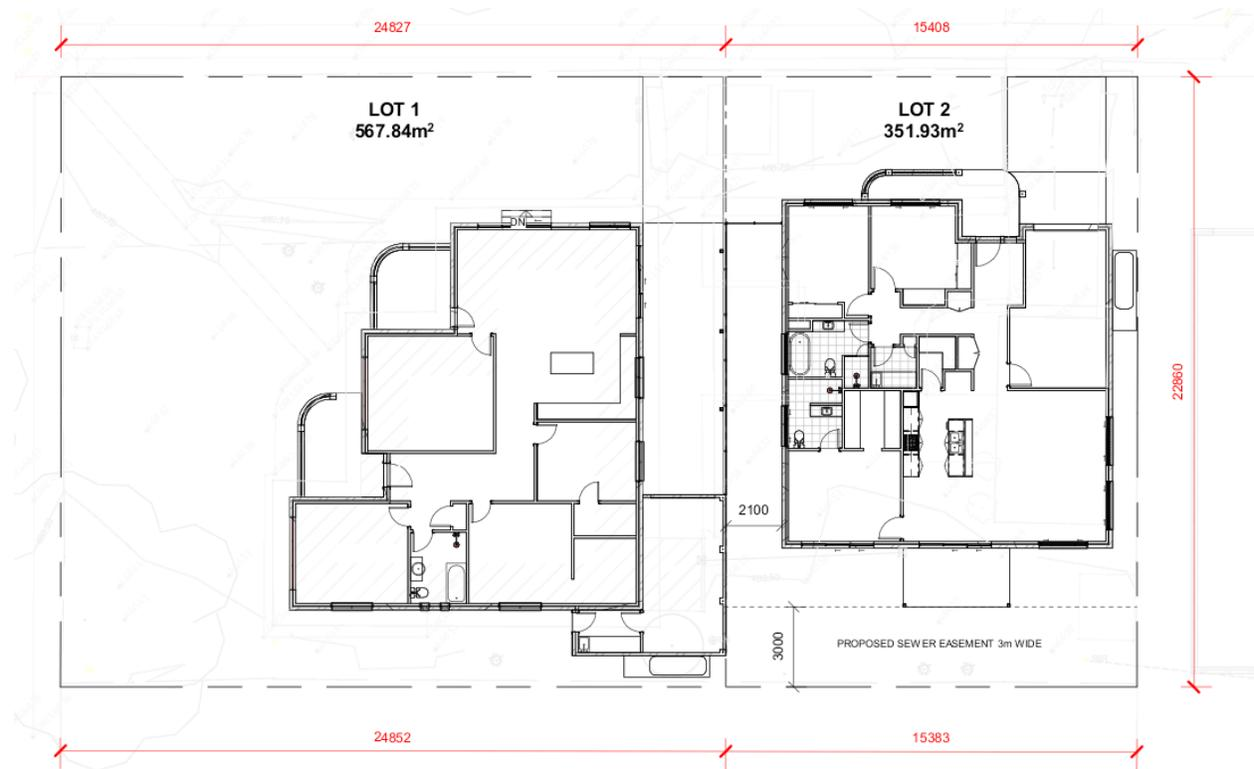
SUBDIVISION PLAN (BL DESIGNS)
